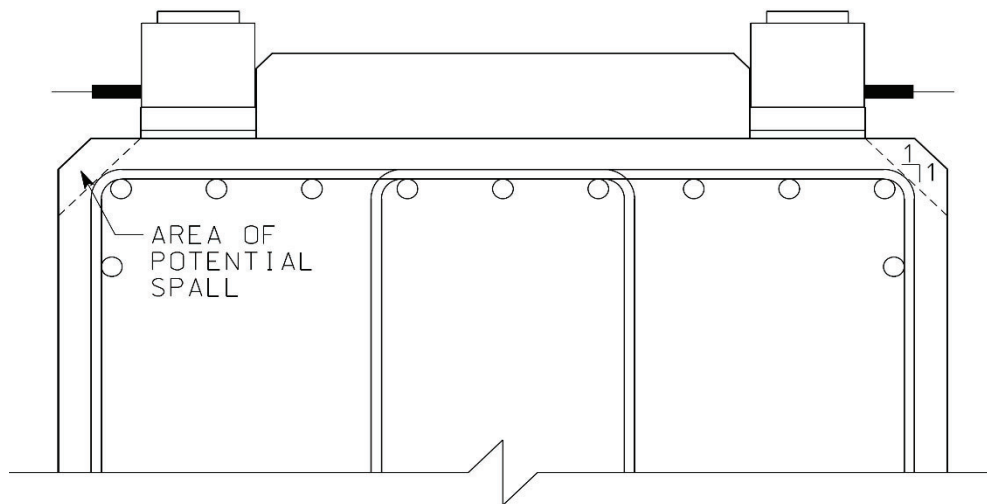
Location of jack to minimize spalling at edge of bent cap
